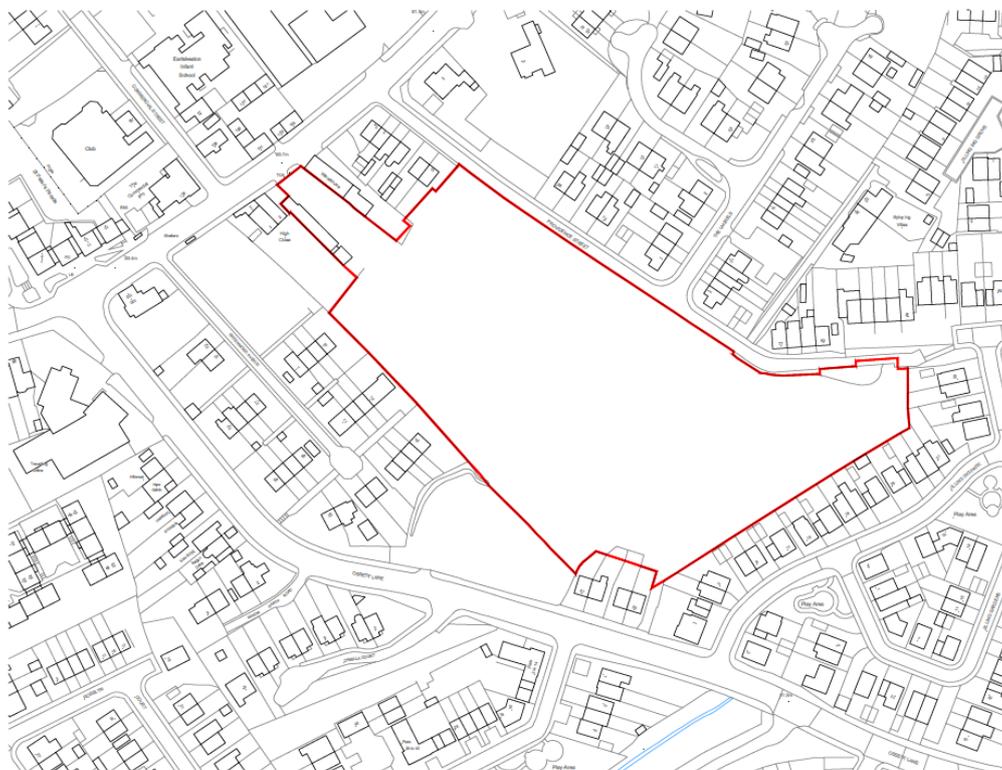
Extract of site location plan scaled at 1:1250. The site area is approximately 0.73 hectares.
